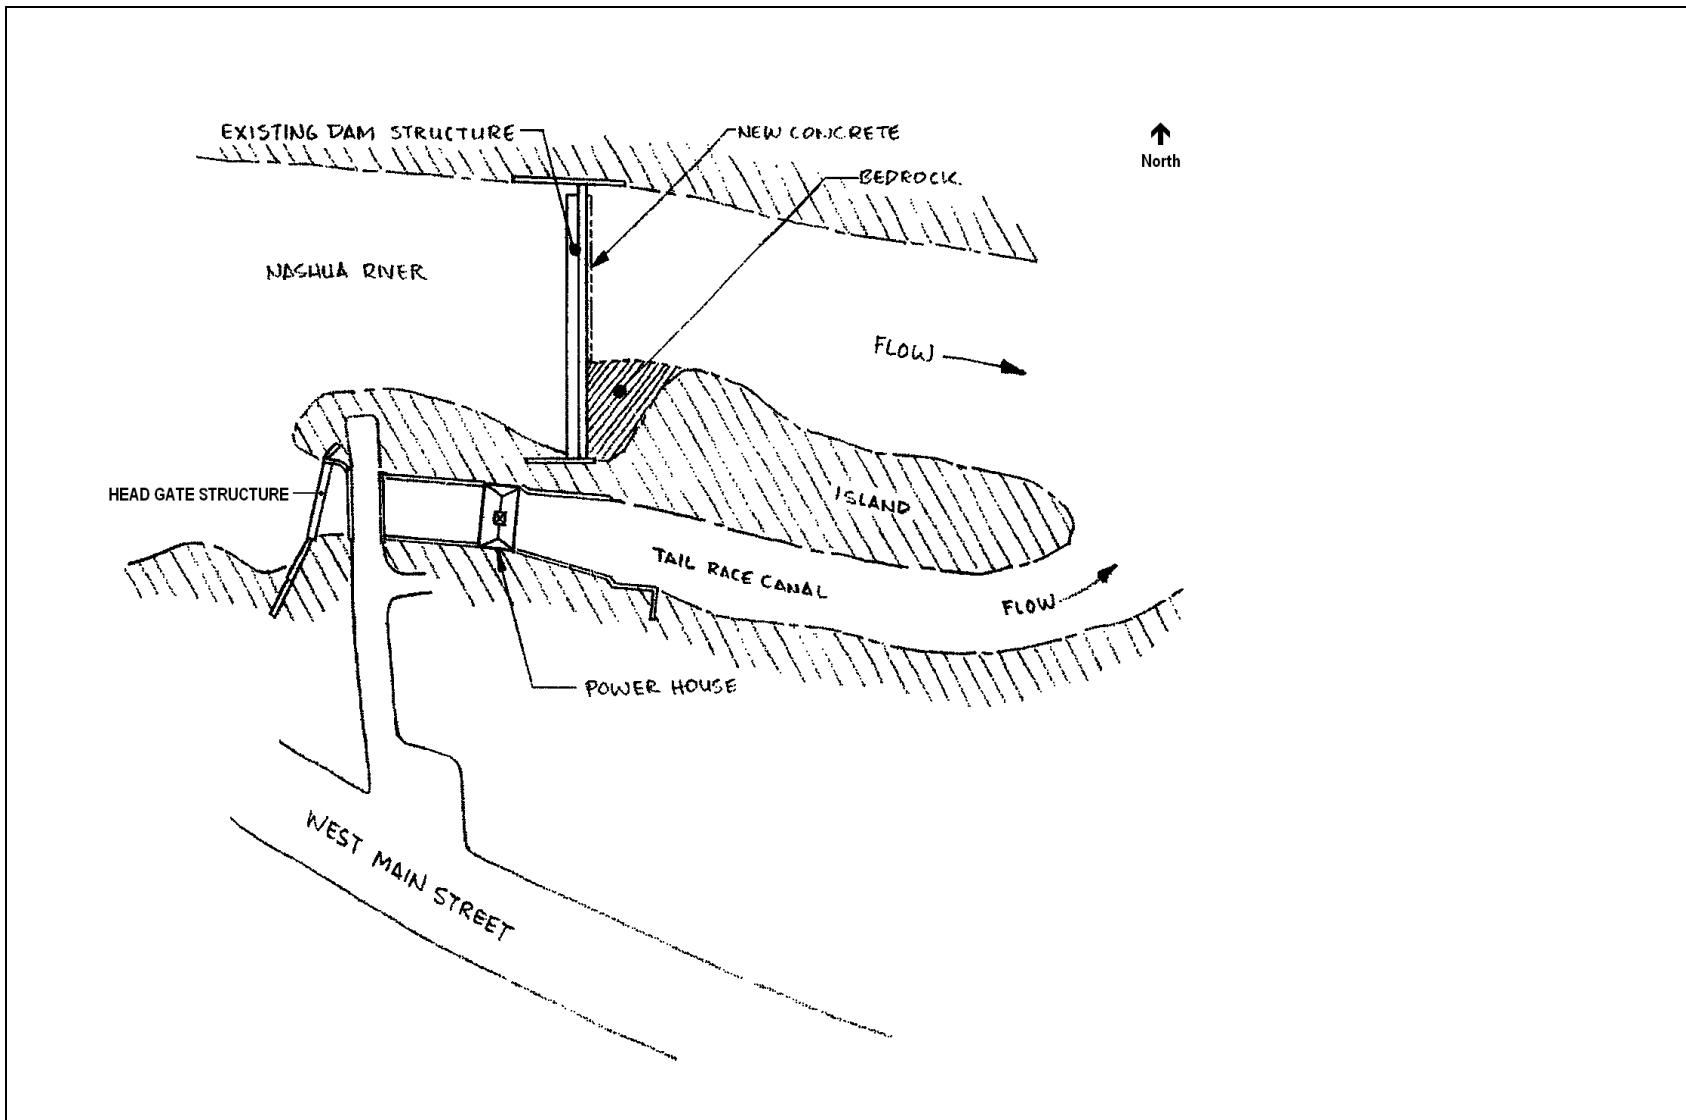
Ice House Project Site Plan (Source: Ice House Partners, modified by staff)
